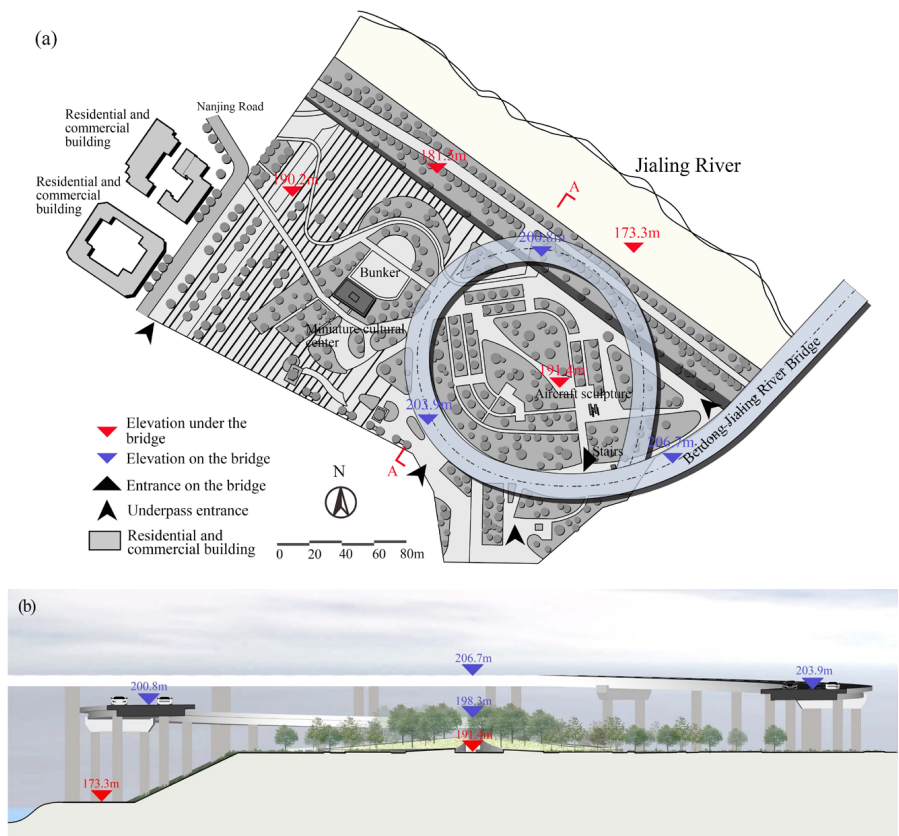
The plan and section of Main Wharf Park: (a) Plan, (b) A-A Section.
